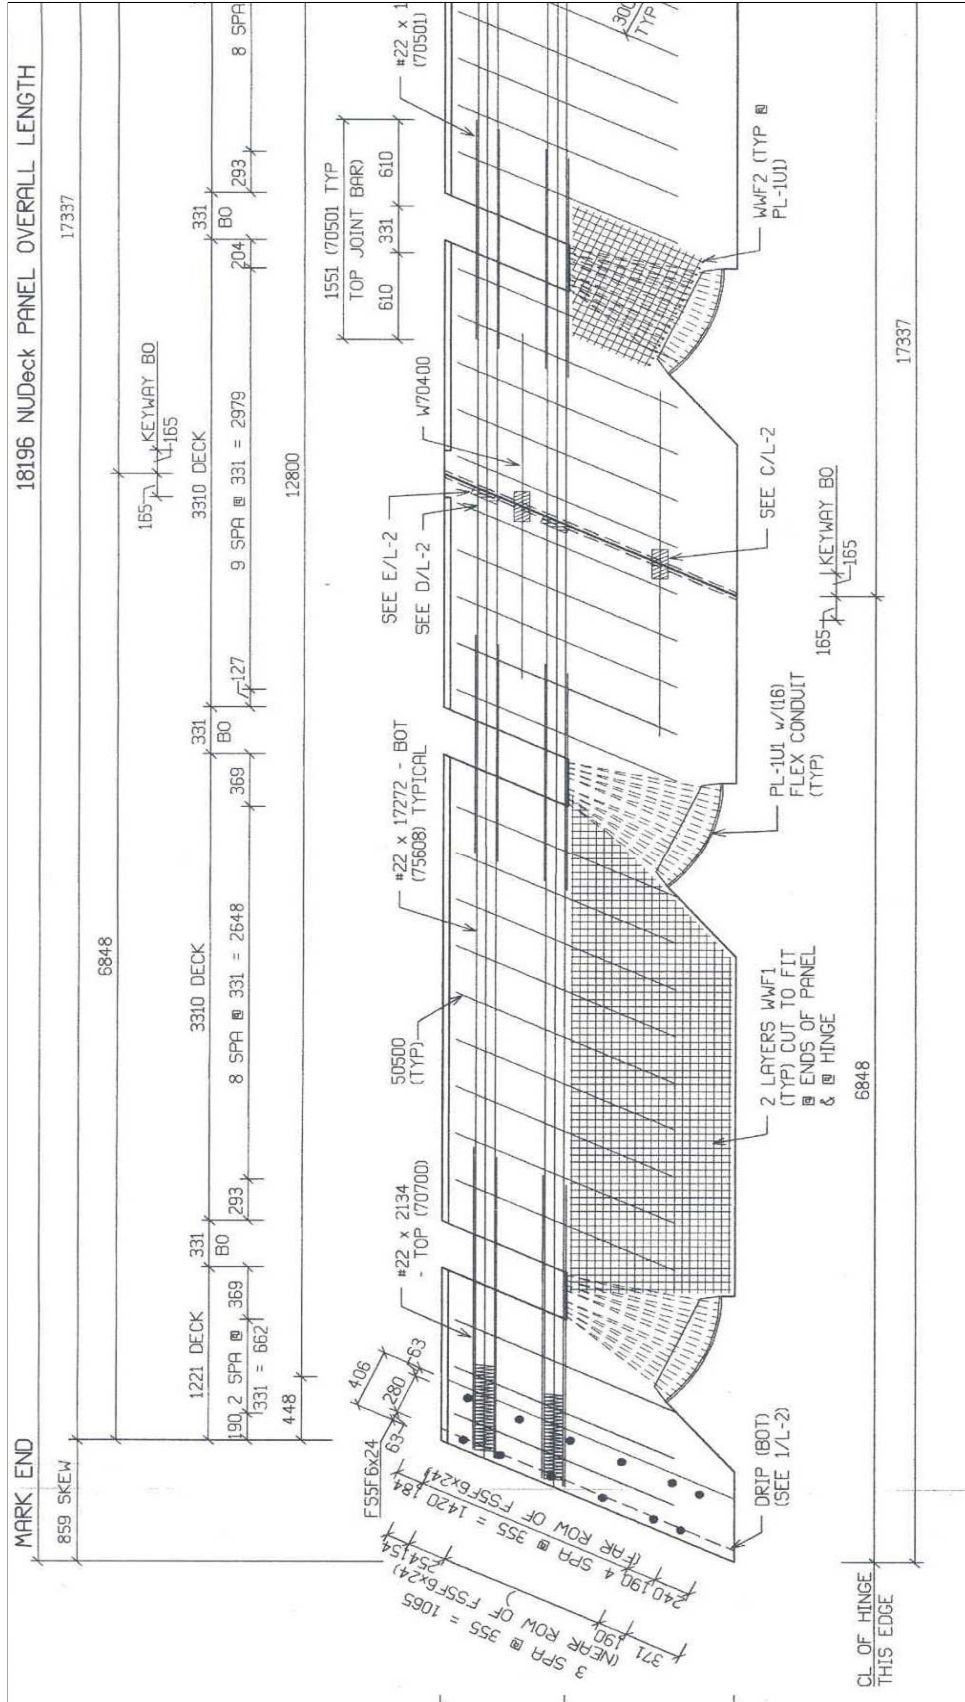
NU-Deck end panel plan view (NDOR, 2003)
